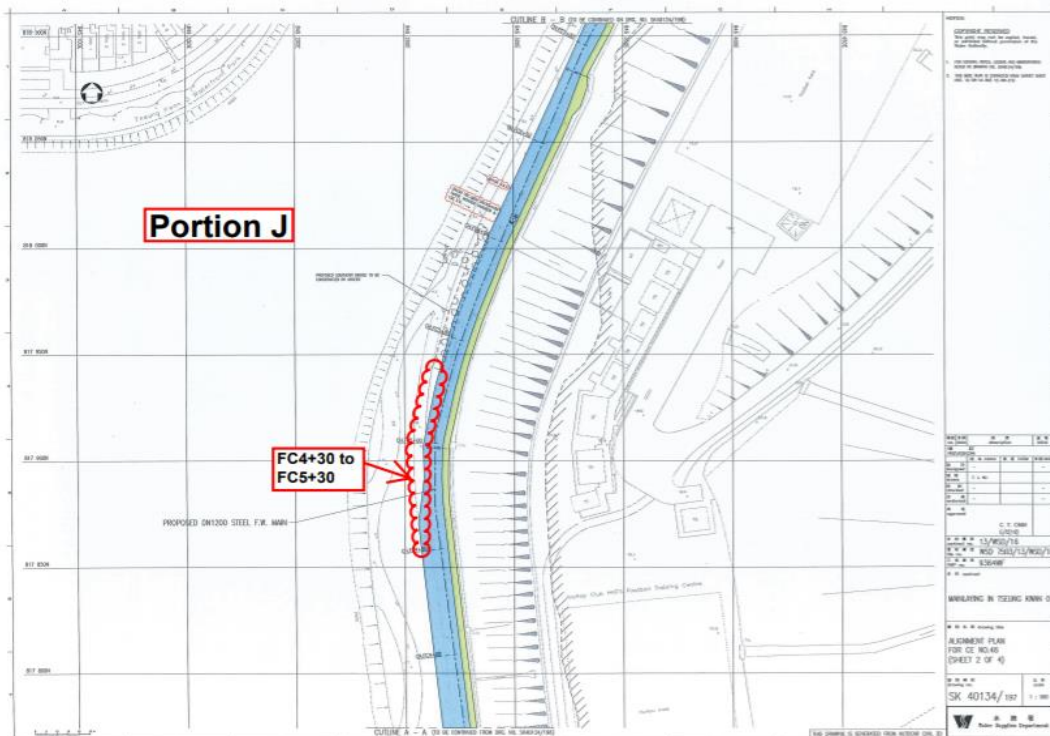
Location Plan – Landfill Stage 1 (Area FC4+30 -FC5+30)
